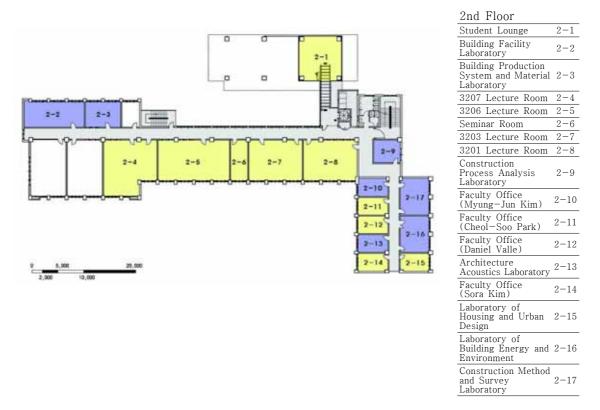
Key Plan of the ACB and the ASA: 2nd Floor
